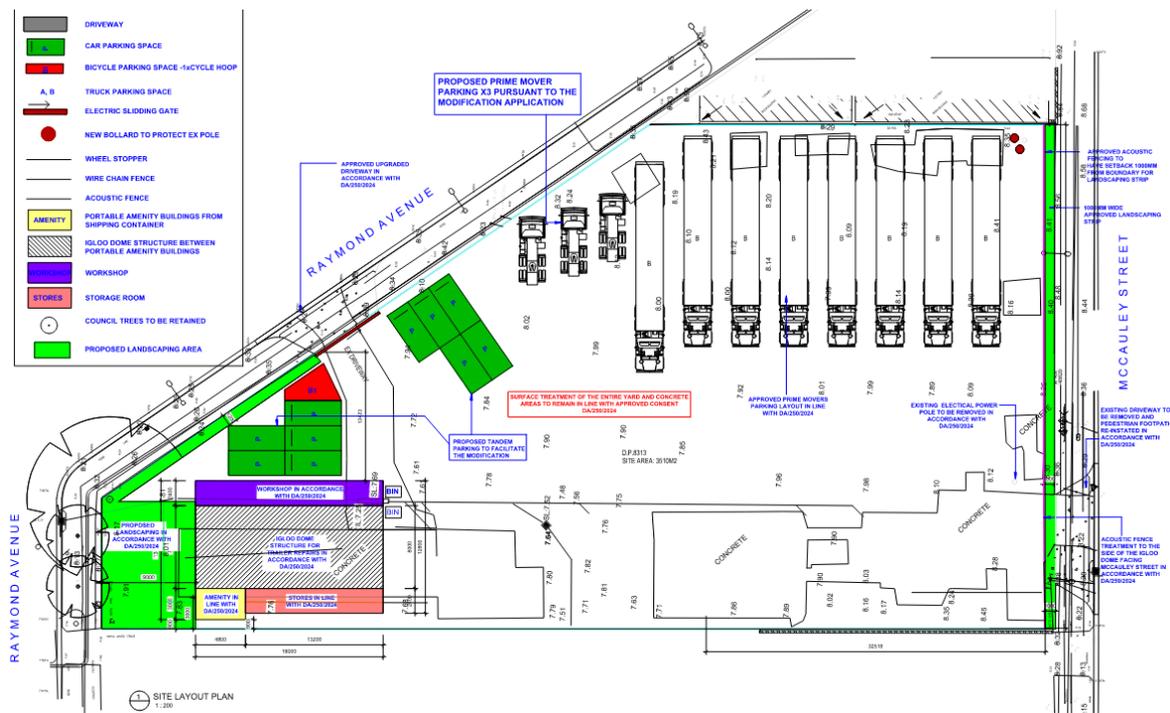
Proposed site plan (Source: Price & Speed Containers)
